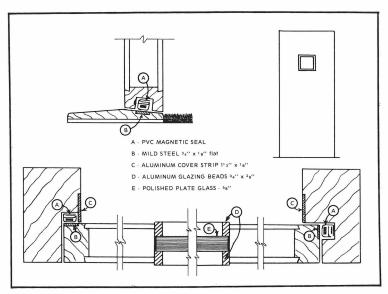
A BBC door design utilizing magnetic seals of the type used on refrigerator doors.
